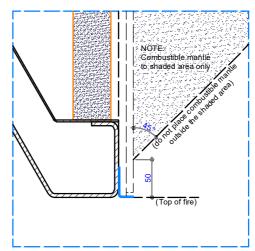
Cross Section Fire Surround Opt. 5 Timber Cavity
